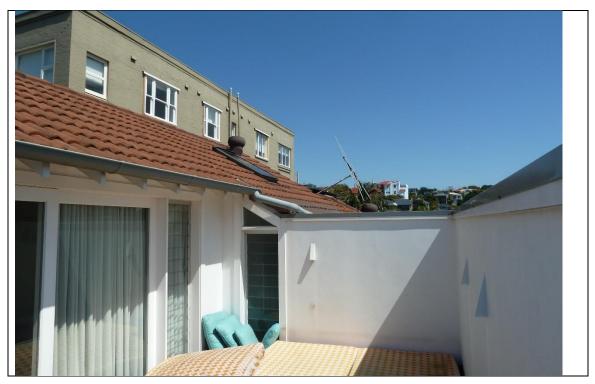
Existing terrace balcony off the first floor master bedroom, to be retained.
